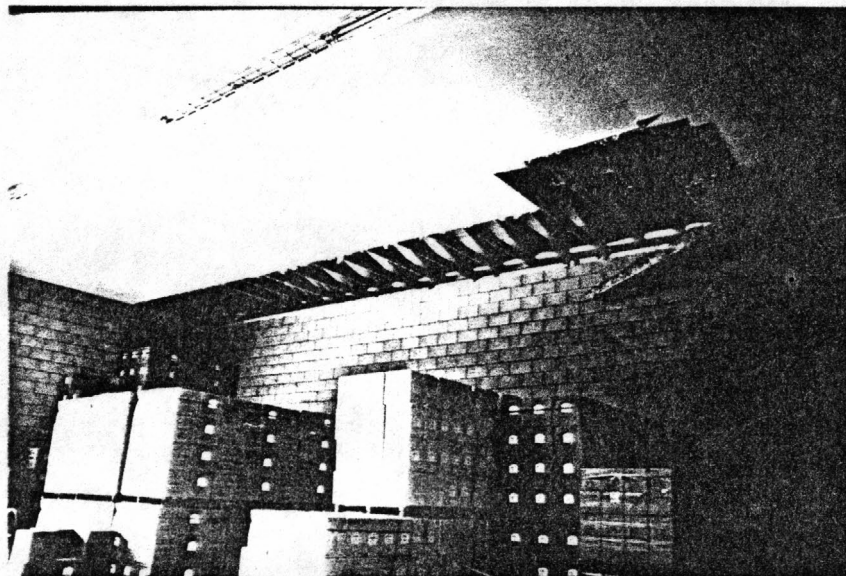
Sheetrock that fell from ceiling adjacent to western-most cinder block wall at the Emilio Guglielmo Winery (location 18).
